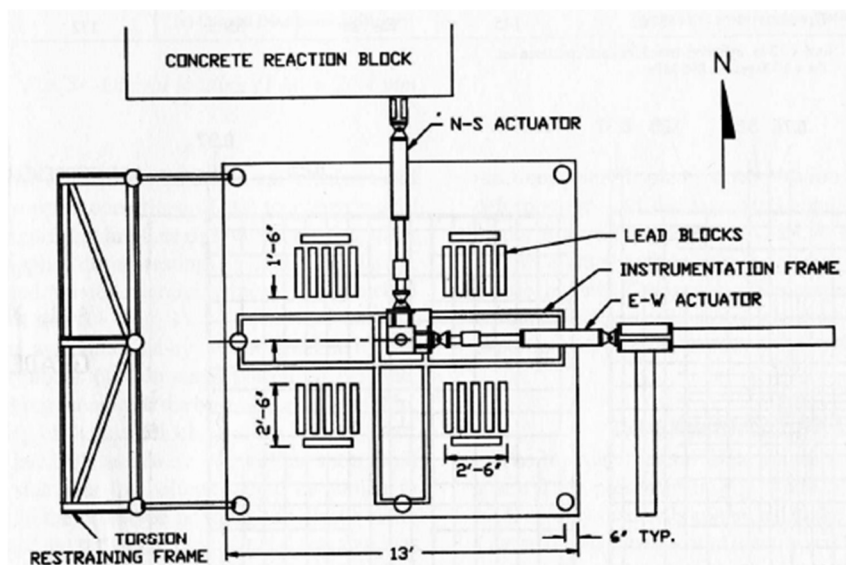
(a)—Test setup: Plan (1 in. = 25.4 mm)
